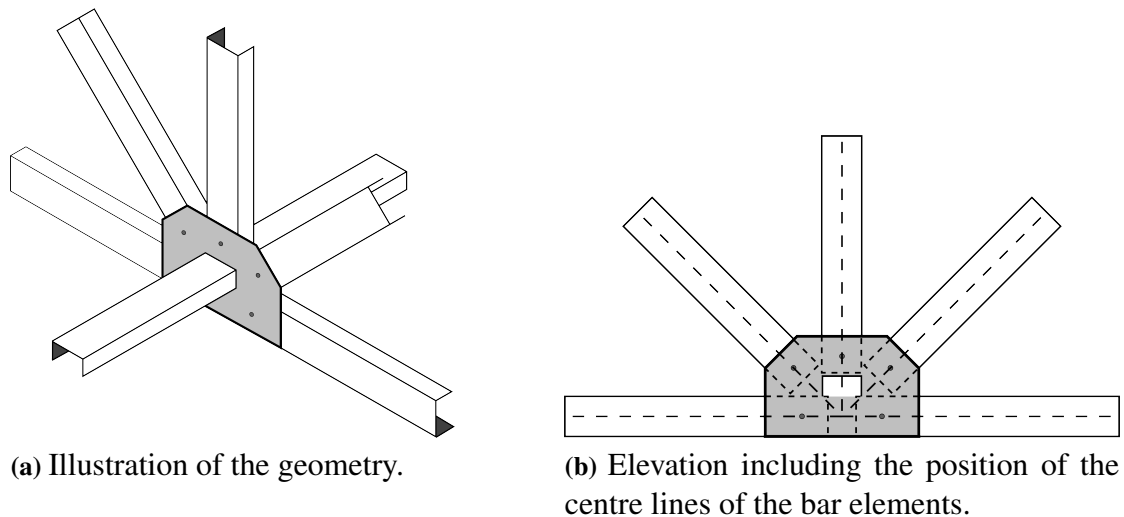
Second iteration of the connection between bar elements in the steel truss.
